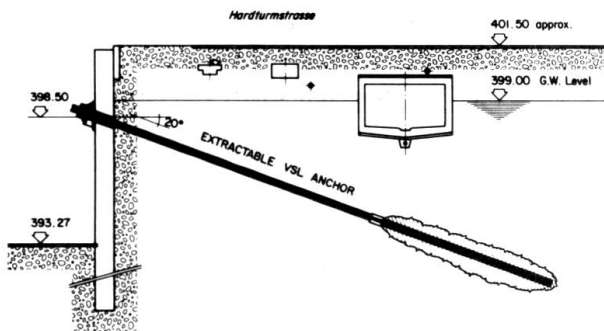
Cross-section of excavation wall with extractable VSL Anchor
